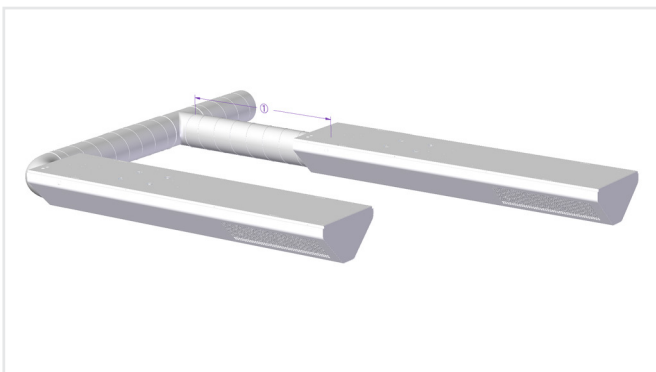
, installation into doctwork ① Recommended min. 5 x Dia.
